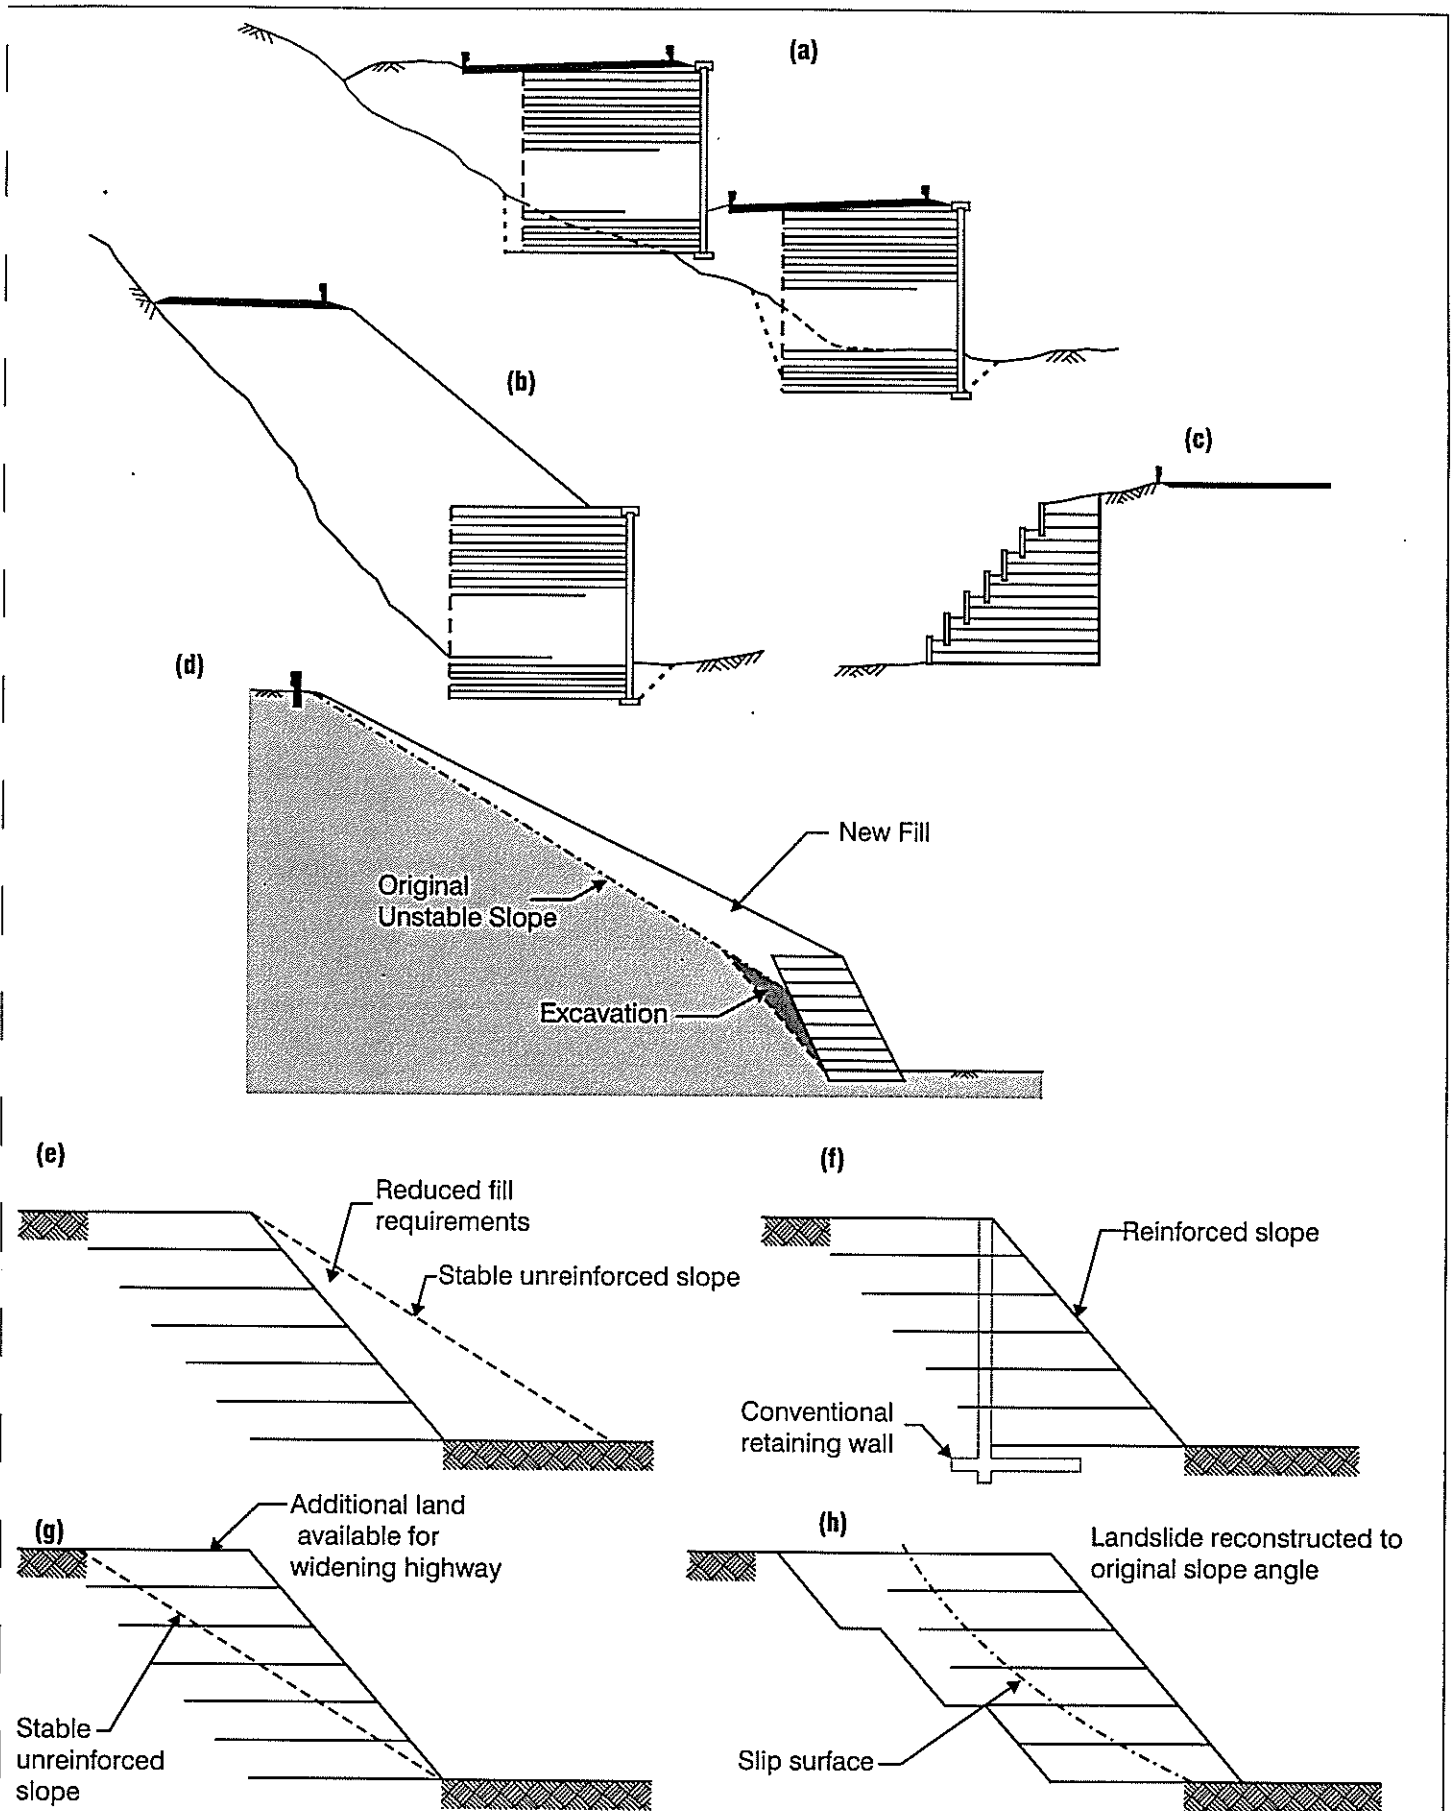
Applications of GRS: (a), (b), (c) reinforced embankments supporting highways; (d) repair of unstable slope; (e) construction of new embankments with reduced fill requirements; (f) alternative to conventional retaining walls; (g) widening existing embankments without encroachment beyond designation boundary; (h) repair of landslides.
